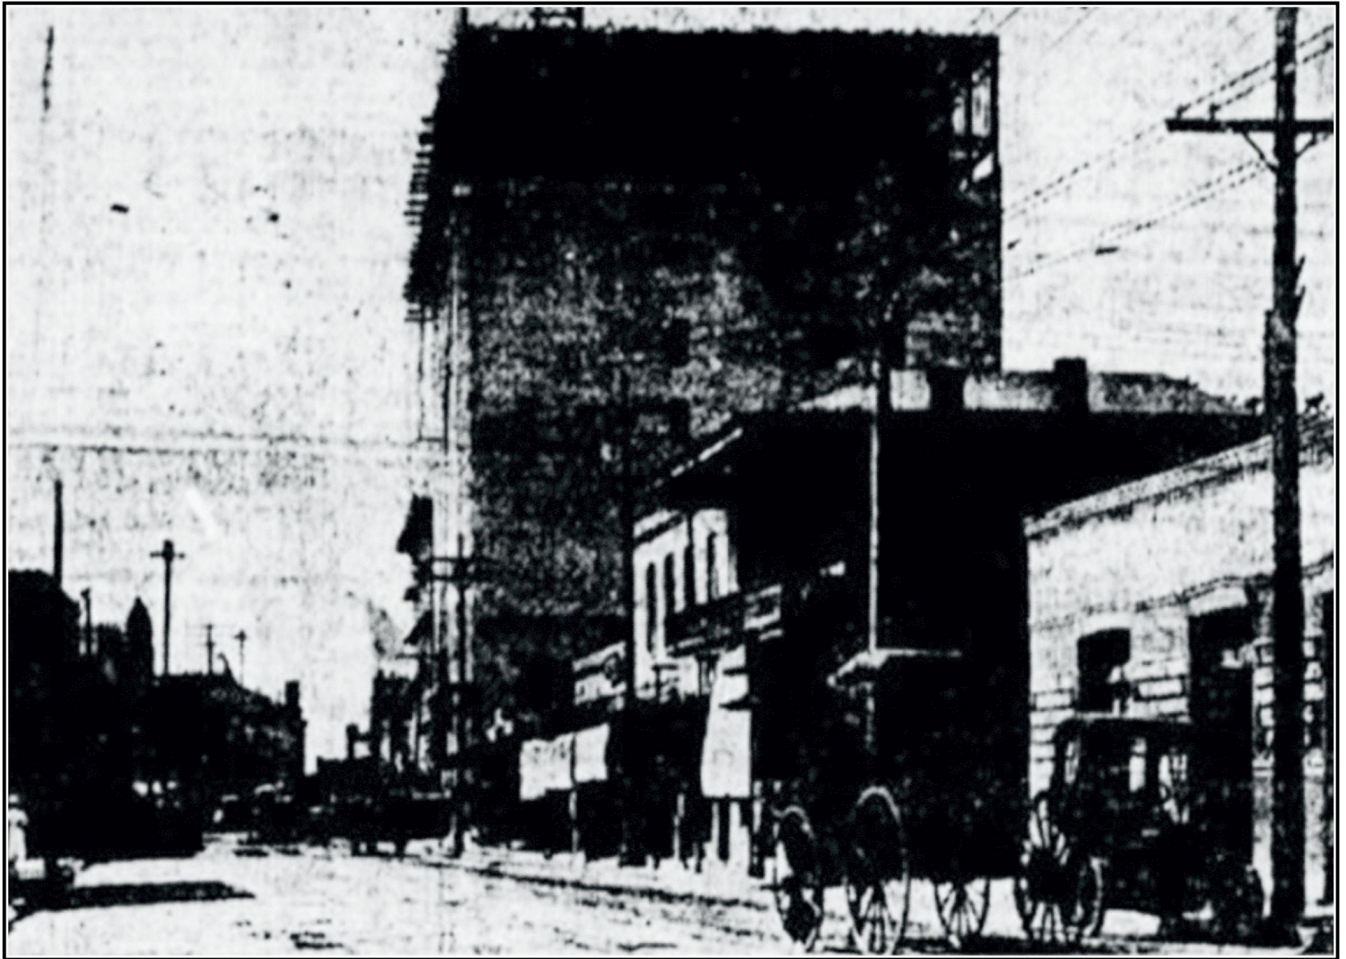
The Stowers Building under construction at the corner of Houston Street and Main Avenue, October 1909.
